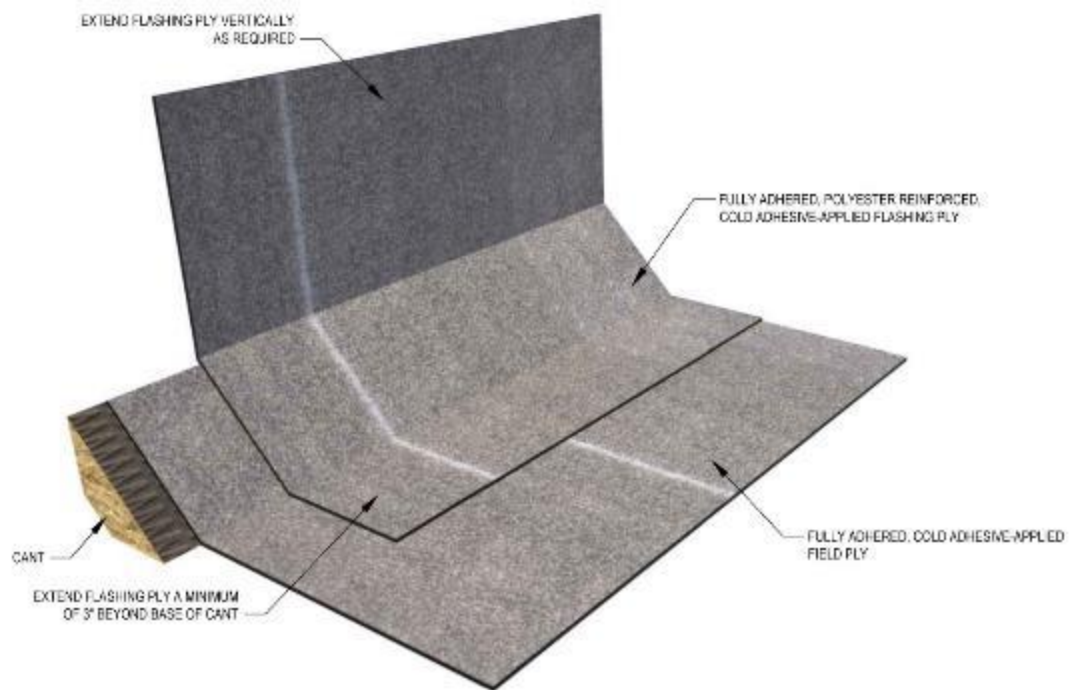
Fully Adhered, Cold Adhesive-Applied Vapor Retarder Flashing at Wall/Curb
